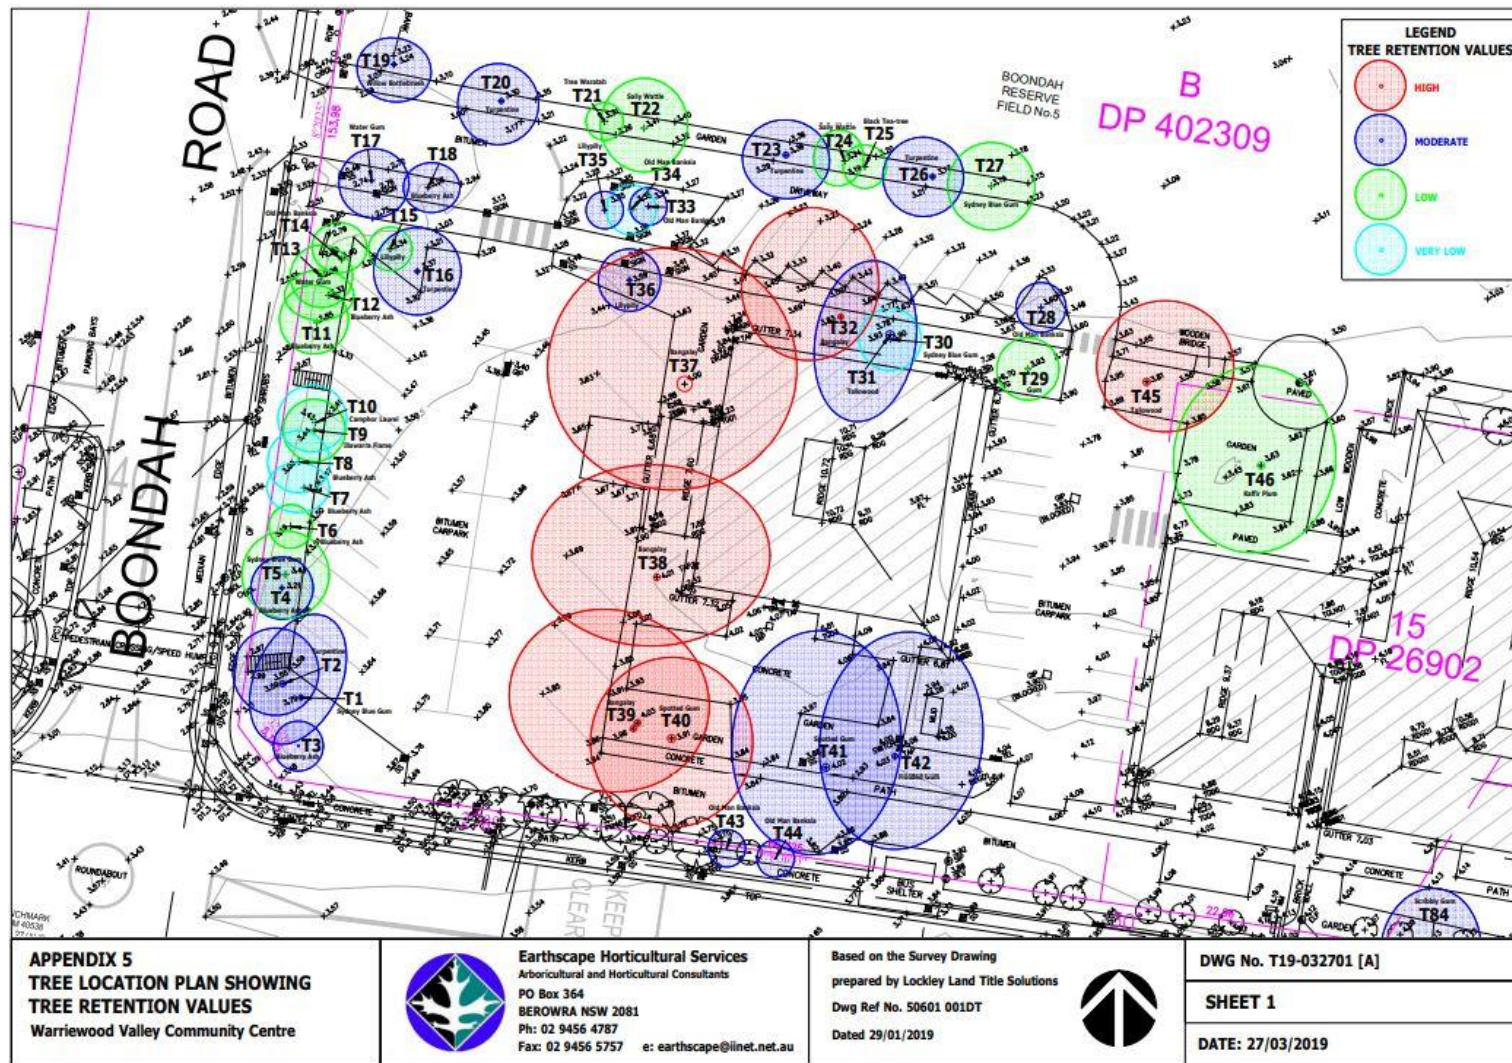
A - Canopy tree plan for the westernmost section of the subject site indicating Tree Numbers (from Earthscape Horticultural Services 2019) and indicative retention values
